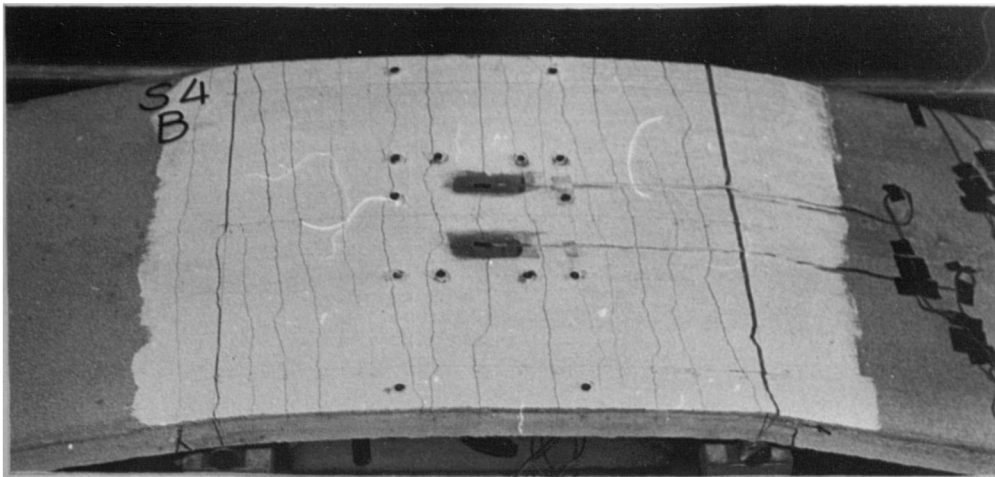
Cracking intensity at failure of typical specimens from series S4.
